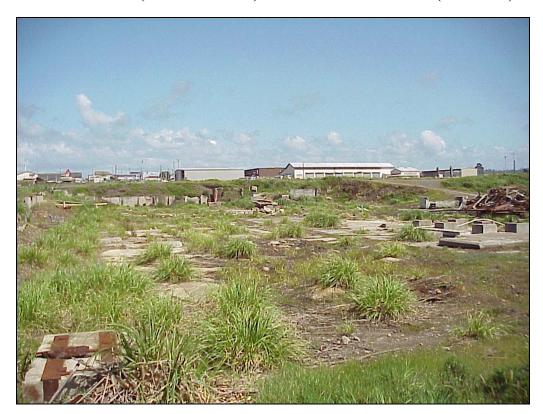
Parcel 4, Former Sawmill #1. View southeast from northwest corner of foundation.
